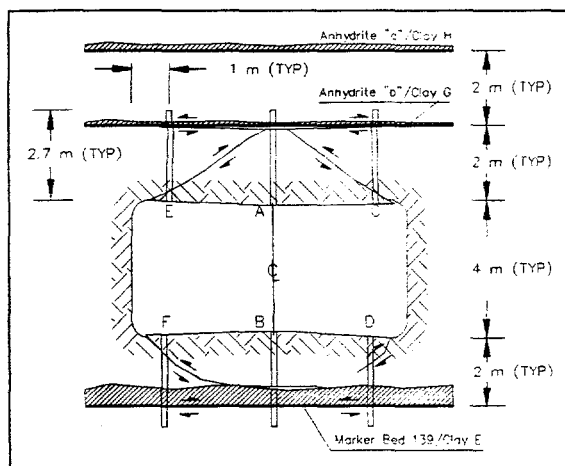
Typical Deformation Patterns Around Underground Openings at the WIPP (Francke and Terrill, 1993)
